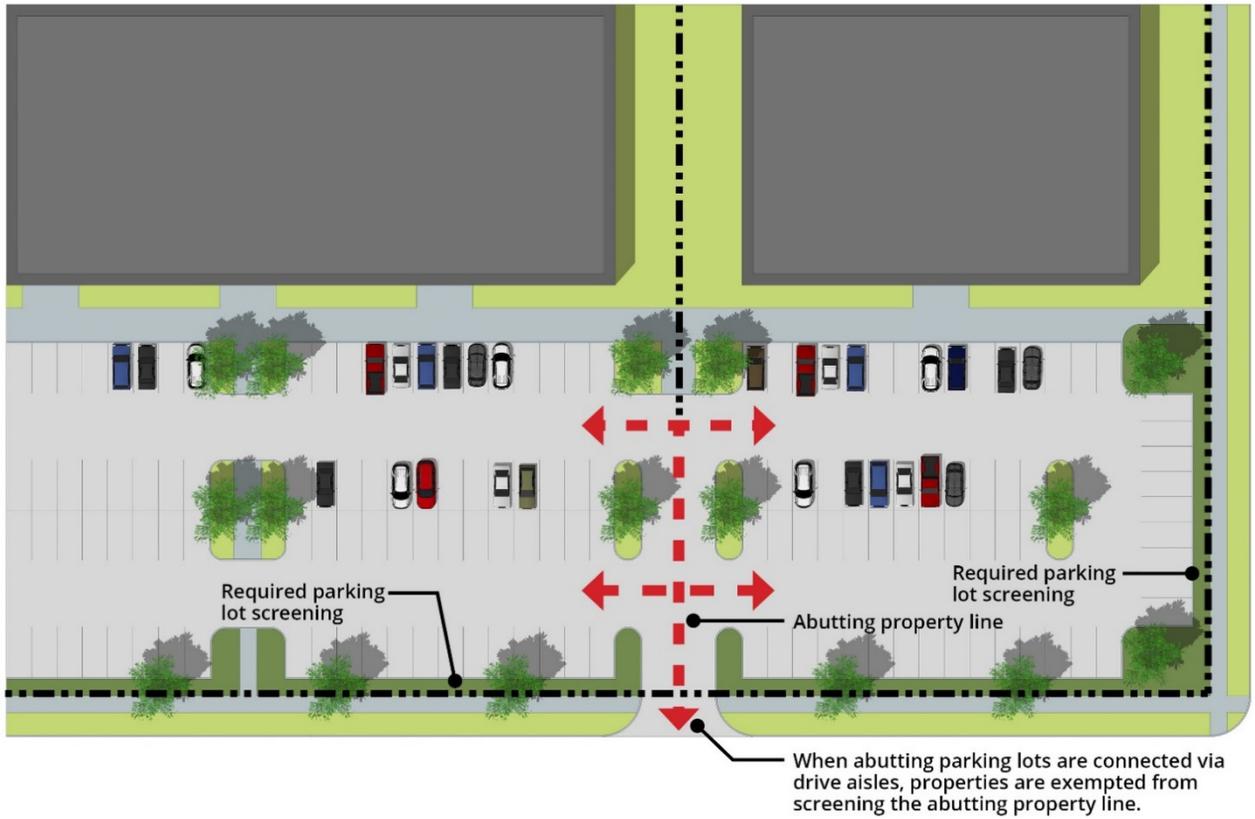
ABUTTING PARKING LOTS DIAGRAM
